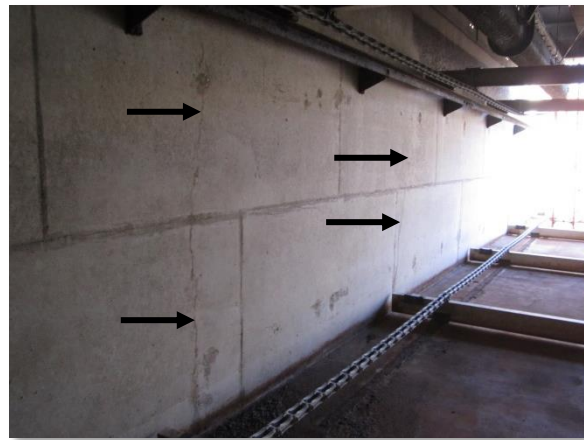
Typical vertical cracks spaced every few feet along length of north wall.
